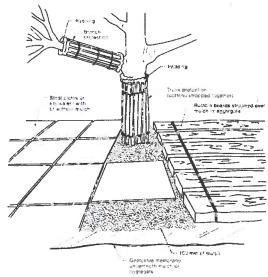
indicative detail of ground protection - from AS4970-2009 Protection of Trees on Development Sites, p.17
